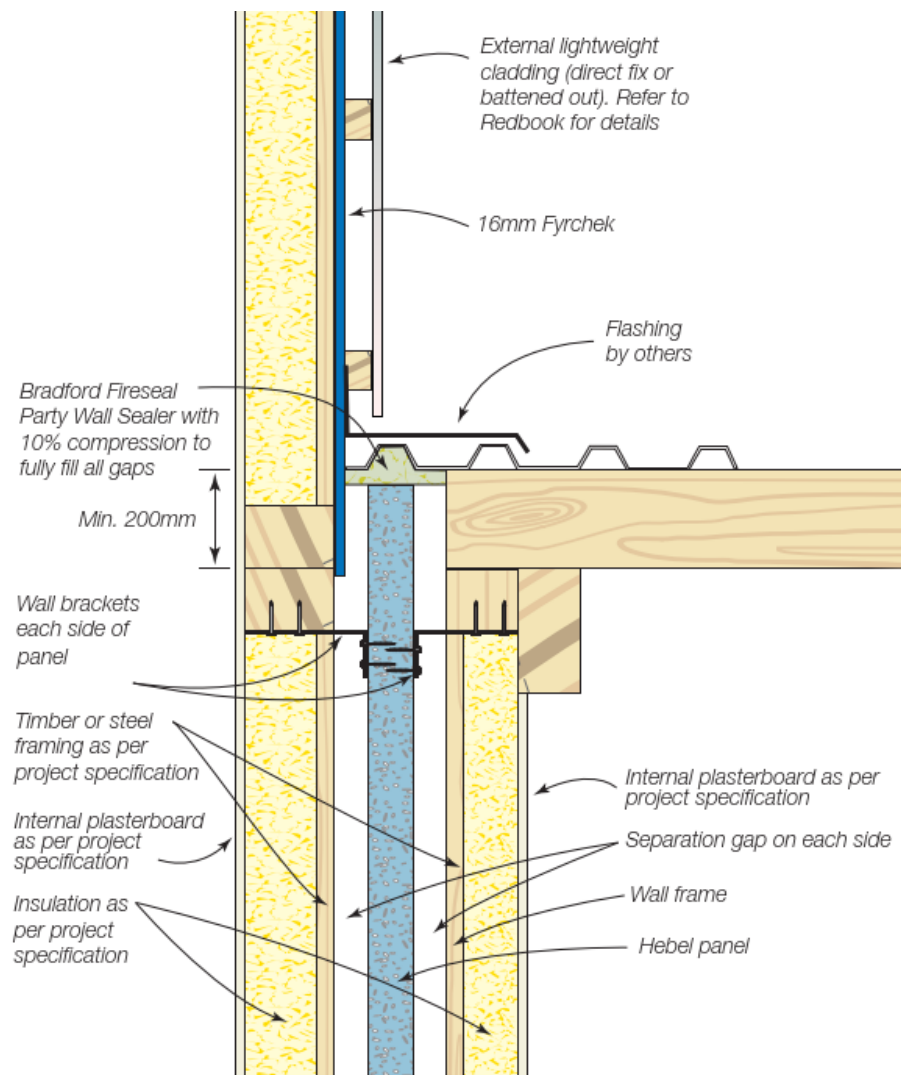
Hebel partywall to external wall detail at stepped roof – 2
